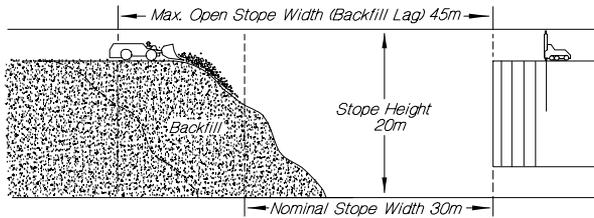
AVOCA Stope example - Fill Lag can be up to 1/2 stope width
